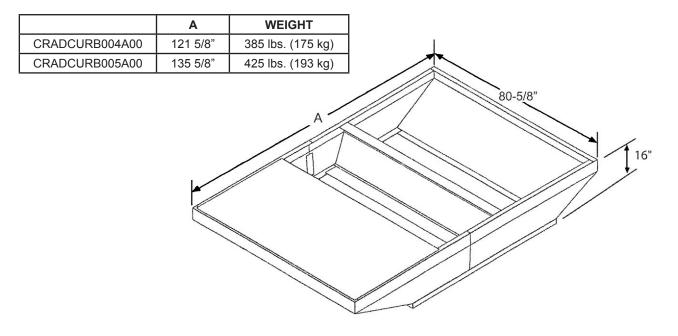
Roof Curb Adapter Dimensions and Weight
